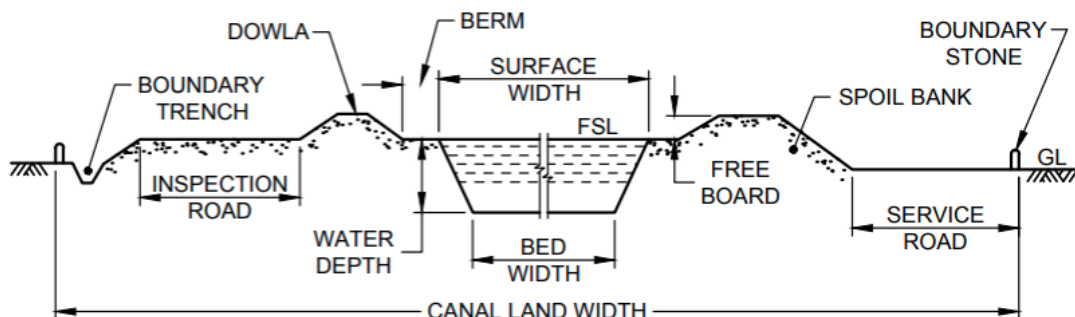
A TYPICAL CROSS — SECTION OF A CANAL
